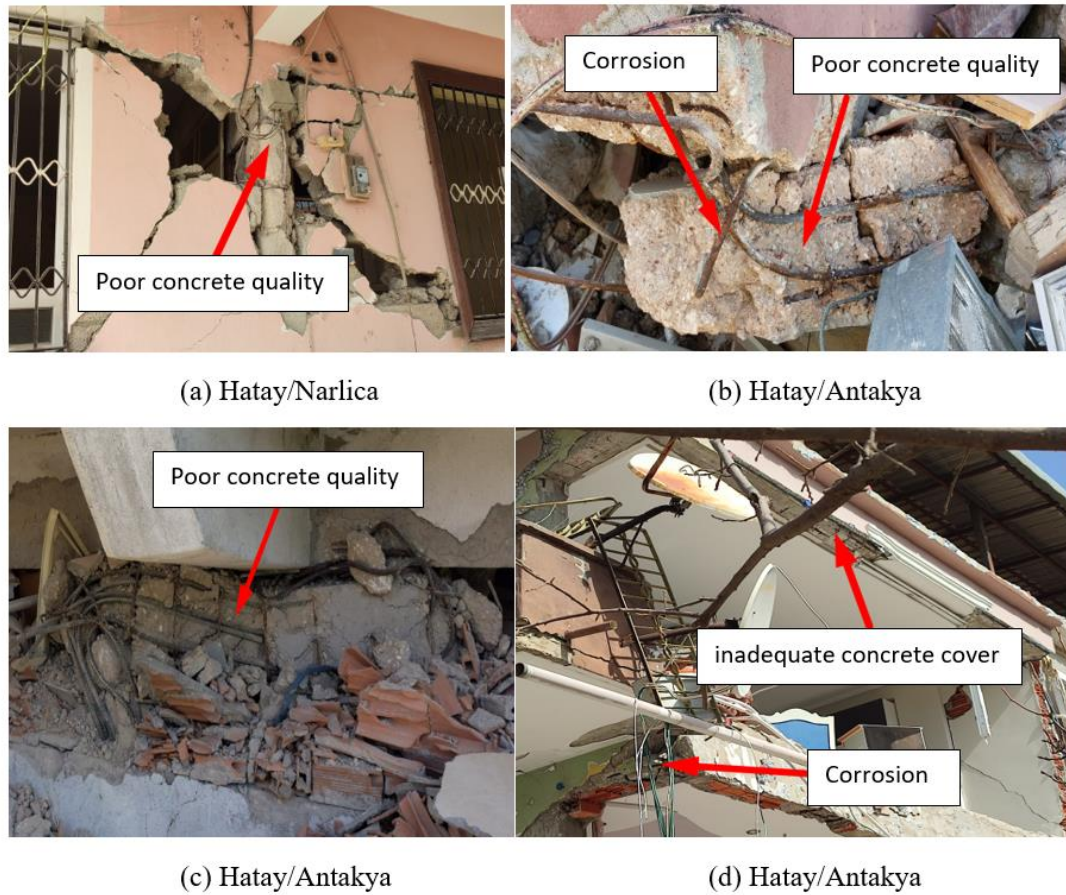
Poor concrete quality, corrosion and inadequate concrete cover related damages
